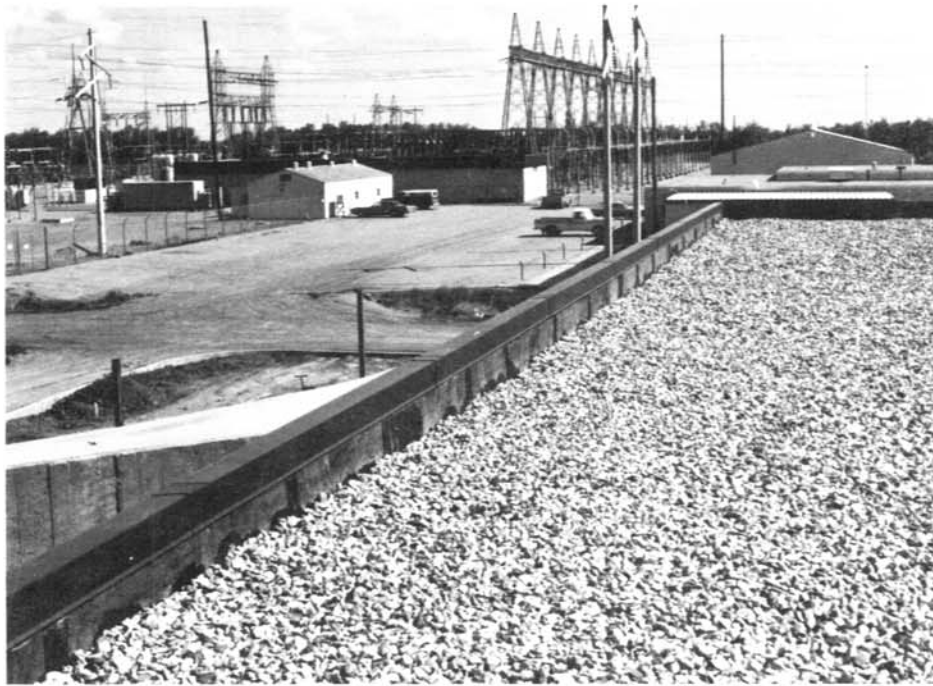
Flashing at building perimeter. This should be inspected for loose seams and punctures.
